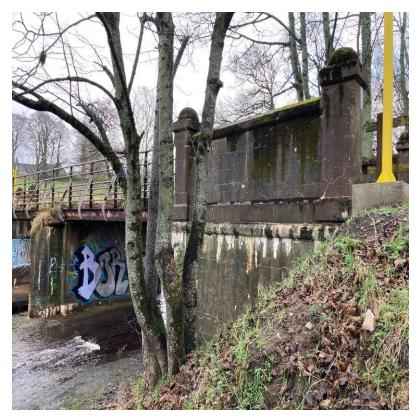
Significant concrete spalled to south-east corner of east abutment leaving approach wing wall partially unsupported.
